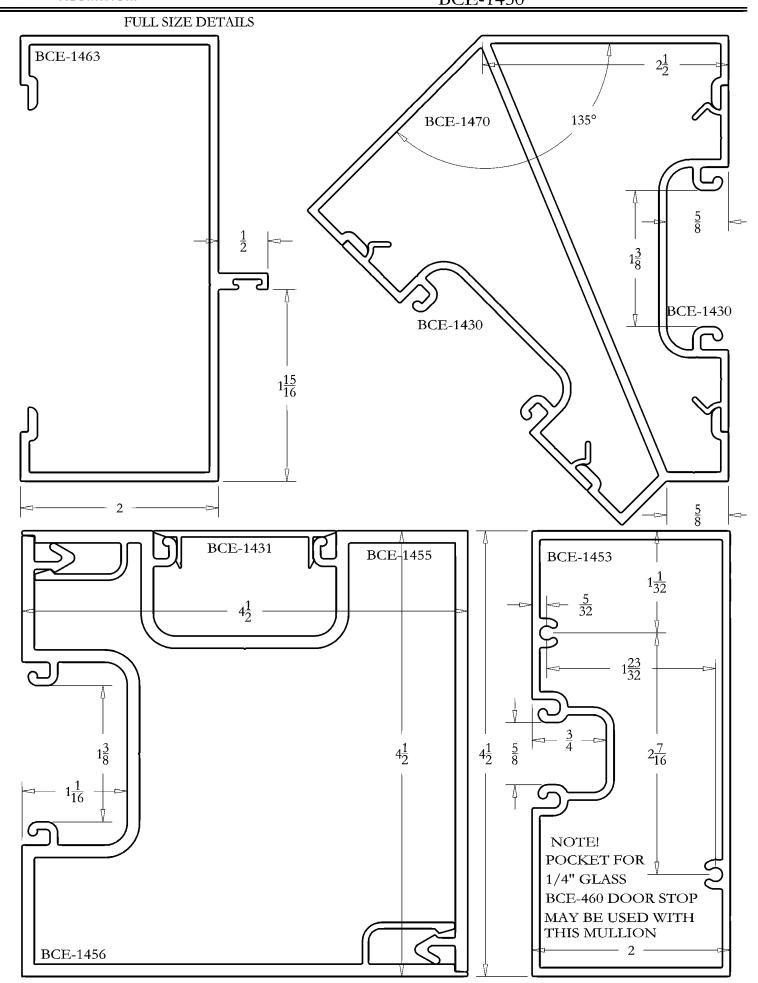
" X 4 1/2" FLUSH GLAZING BCE-1450
